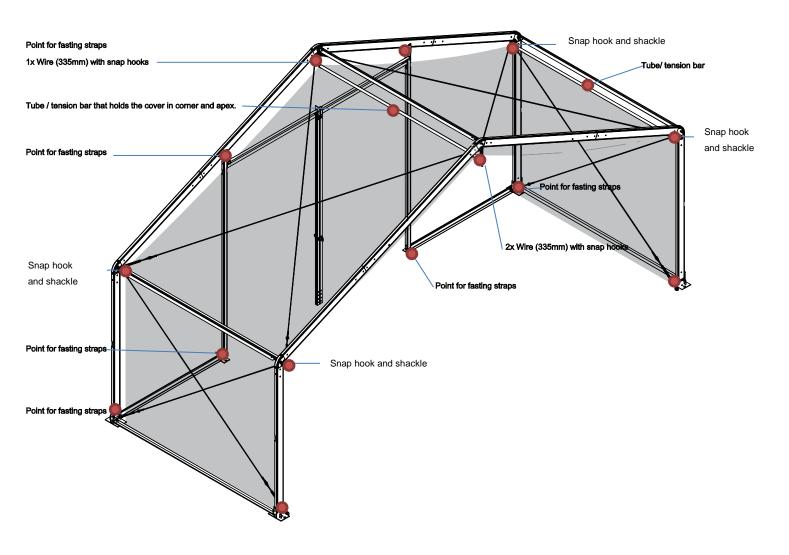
Overview sketch. One section of Wiikhall, 10m width
